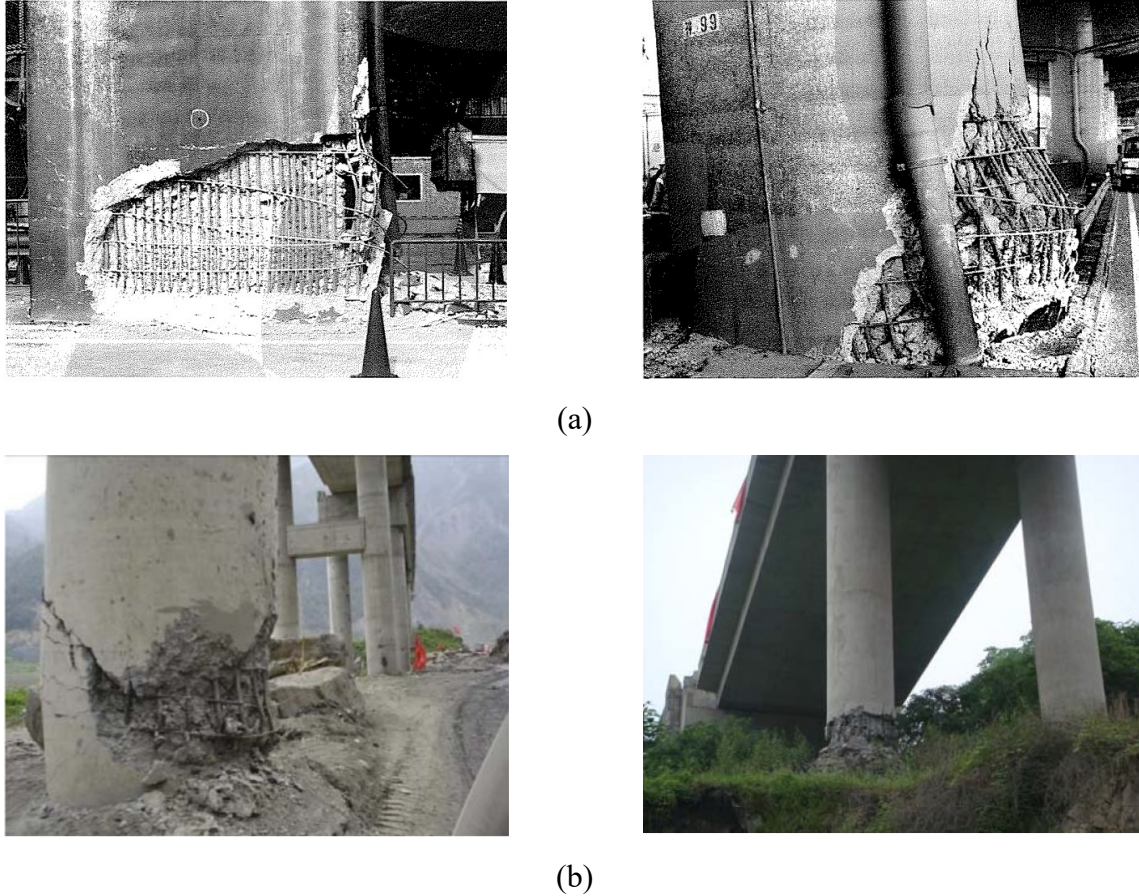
Photos of the damaged bridge pier columns from (a) Kobe earthquake 1995 [5], and (b) Wenchuan earthquake, 2008 [1]
